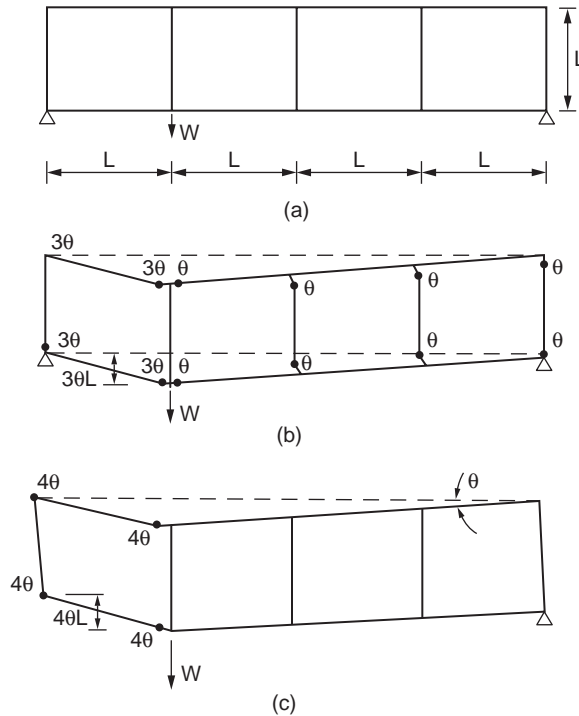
Collapse mechanism of a Vierendeel girder.
